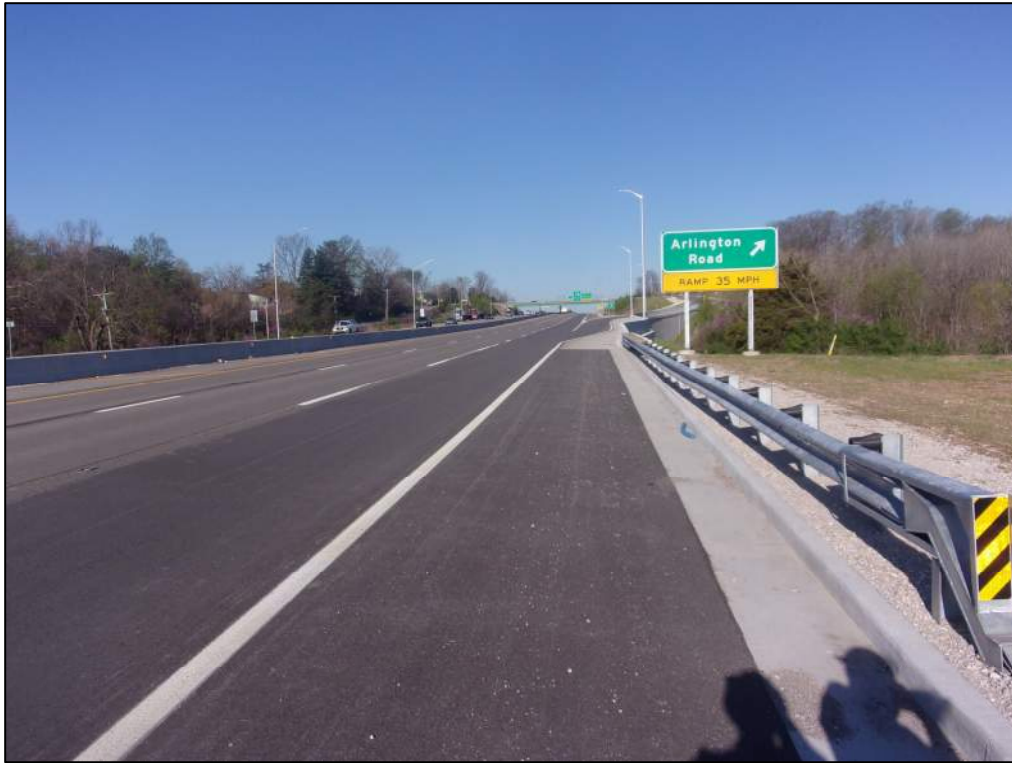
View looking west along the north side of SR 45 from North Monroe Street intersection.
